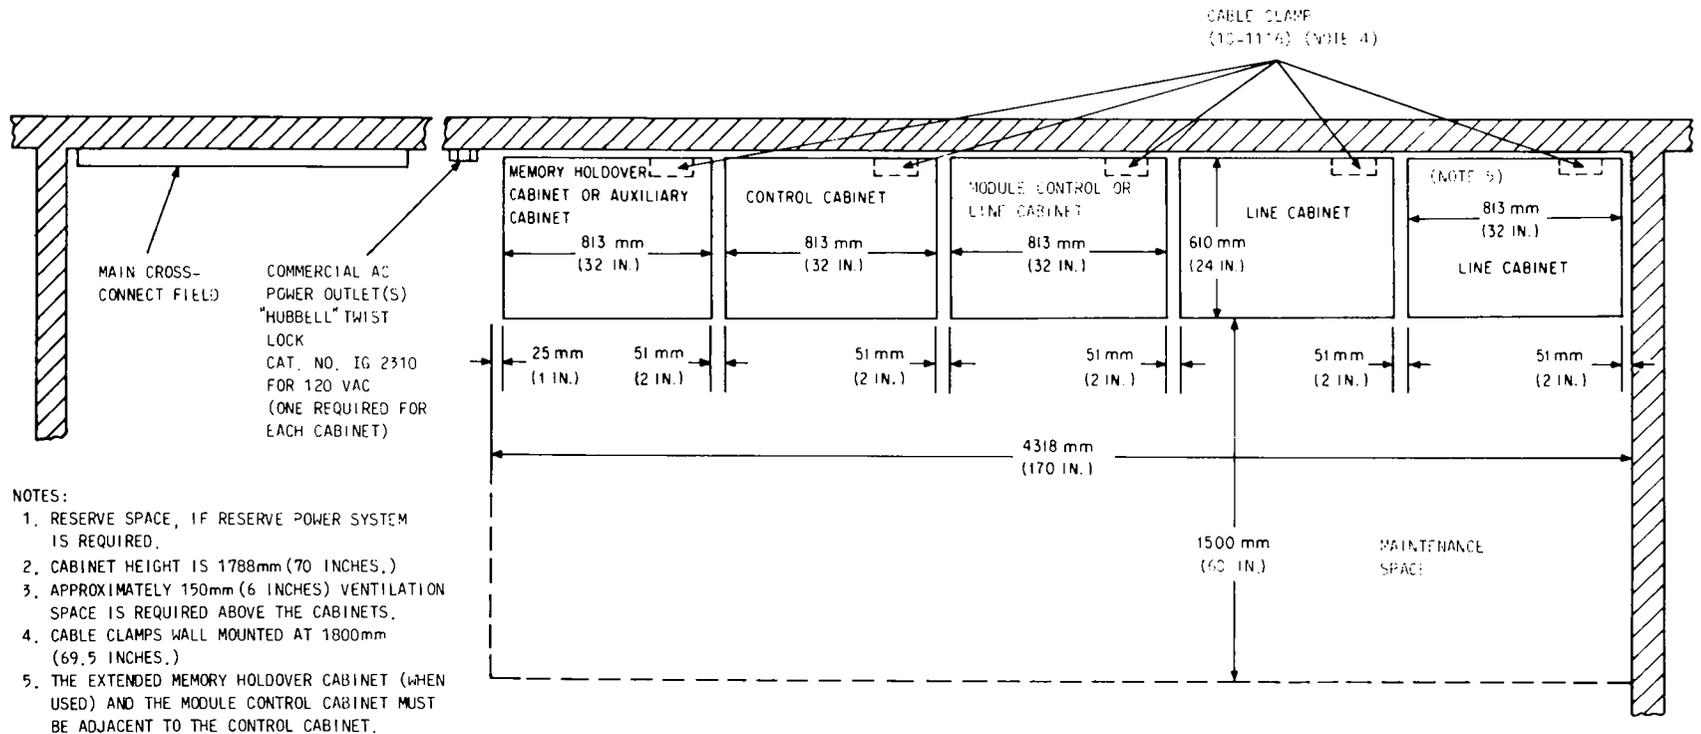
DIMENSION PBX—Minimum Floor Space Requirements—4-Cabinet System
